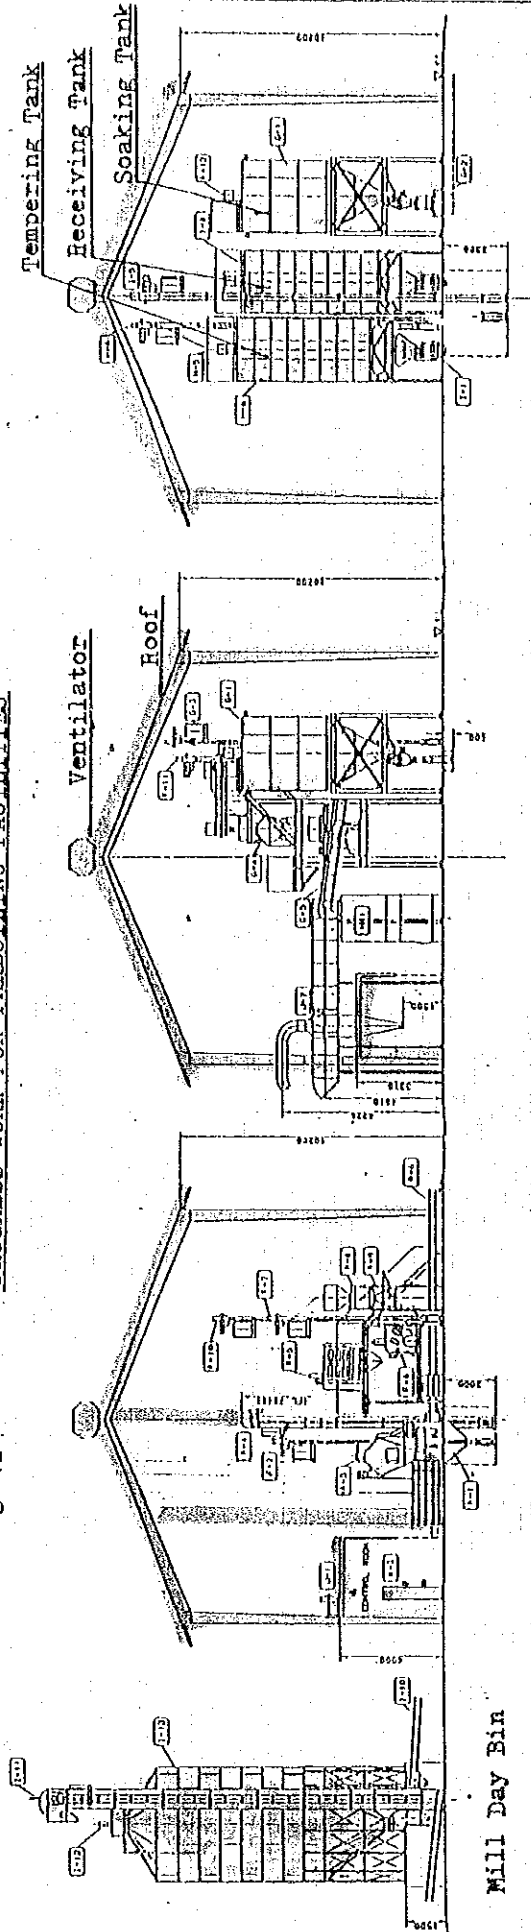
LAYOUT PLAN FOR RICE MILL COMPLEX
